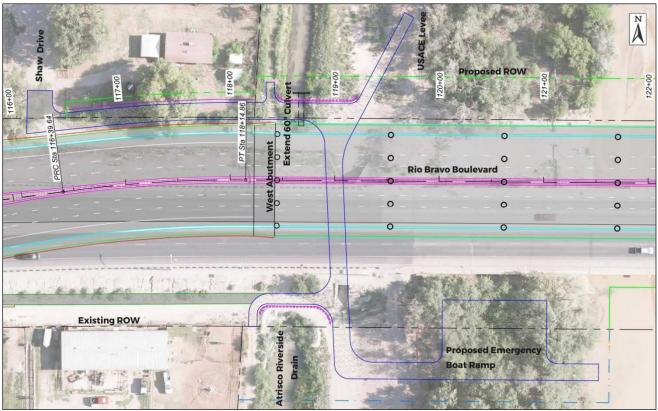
, Plan View of Build Alternative B, Atrisco Drain/West Abutment
